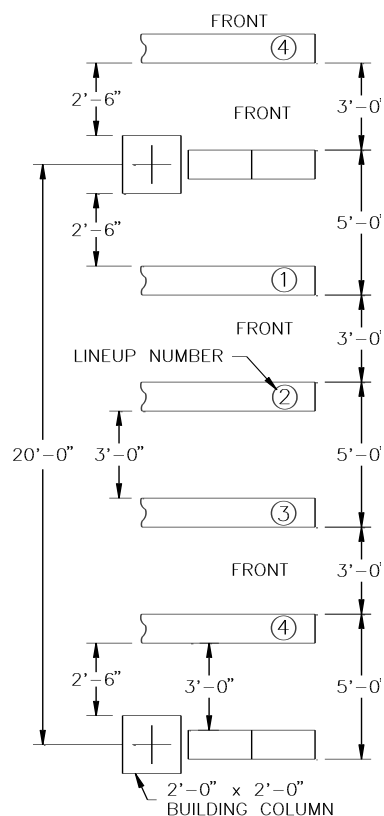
Generic Method Of Cabling Plan For Transport Equipment Frames And Cabinets
